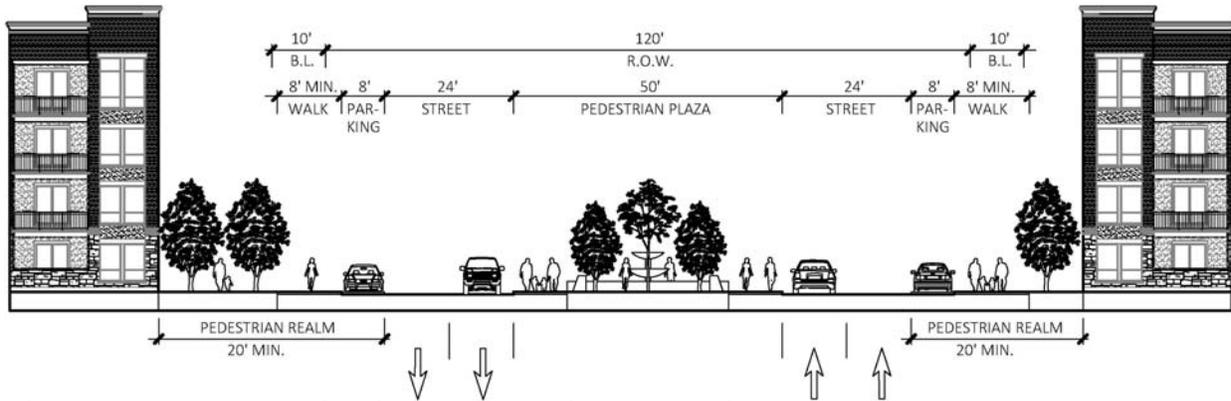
Type 'B' Street @ Pedestrian Plaza (with on street parking)
